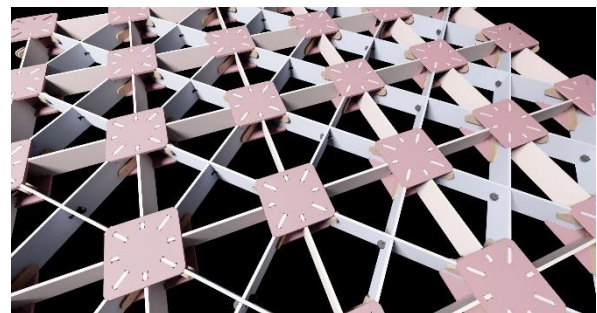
X-Frame 9 – a further developed version of X-Frame that is more cost effective reduces the opportunity for damaged components during assembly/disassembly.
